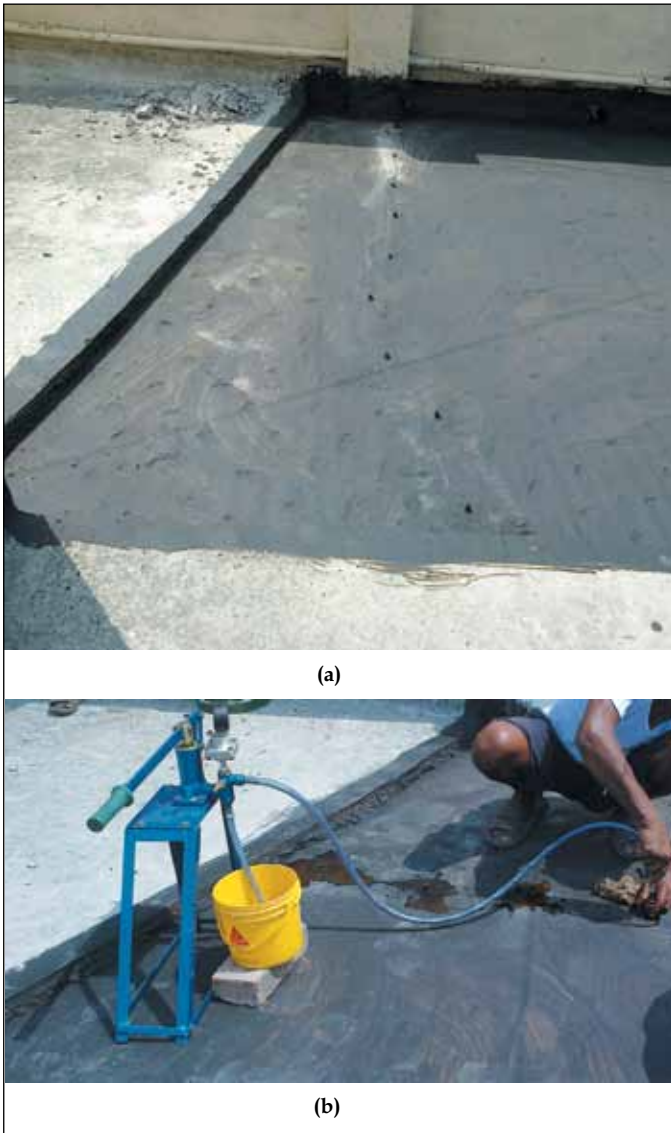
(a) Nozzles fixed along cracks in roof slab (b) Sealing of cracks with epoxy injection
